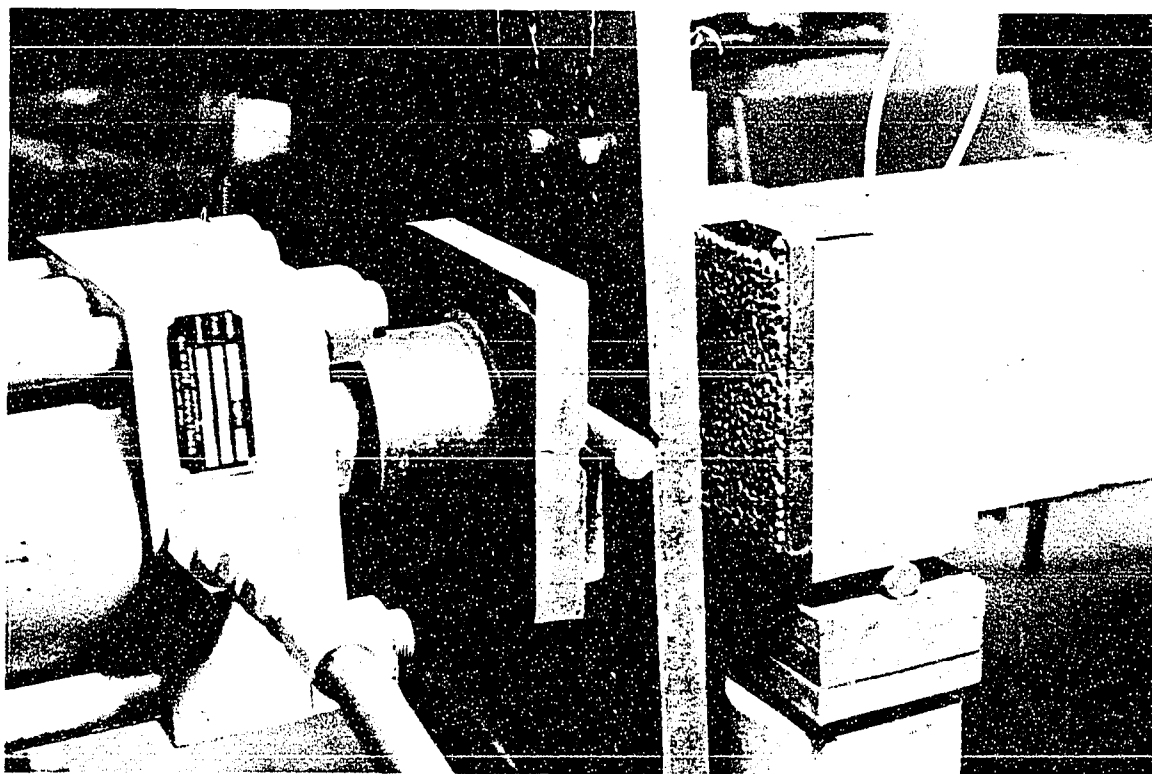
END CONNECTIONS FOR AXIAL LOADING AT THE HYDRAULIC RAM END.
